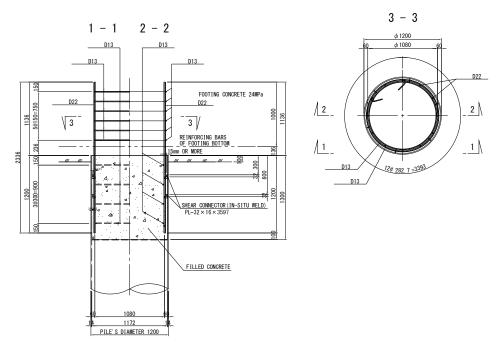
Layout of Reinforcement Stud (P7)
